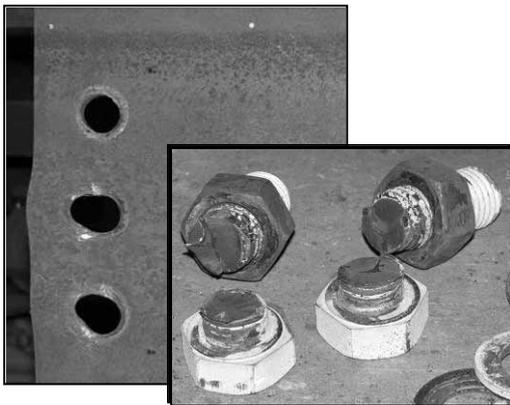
550°C fin plate test. (a) Deformed beam web holes, (b) Sheared bolts.
